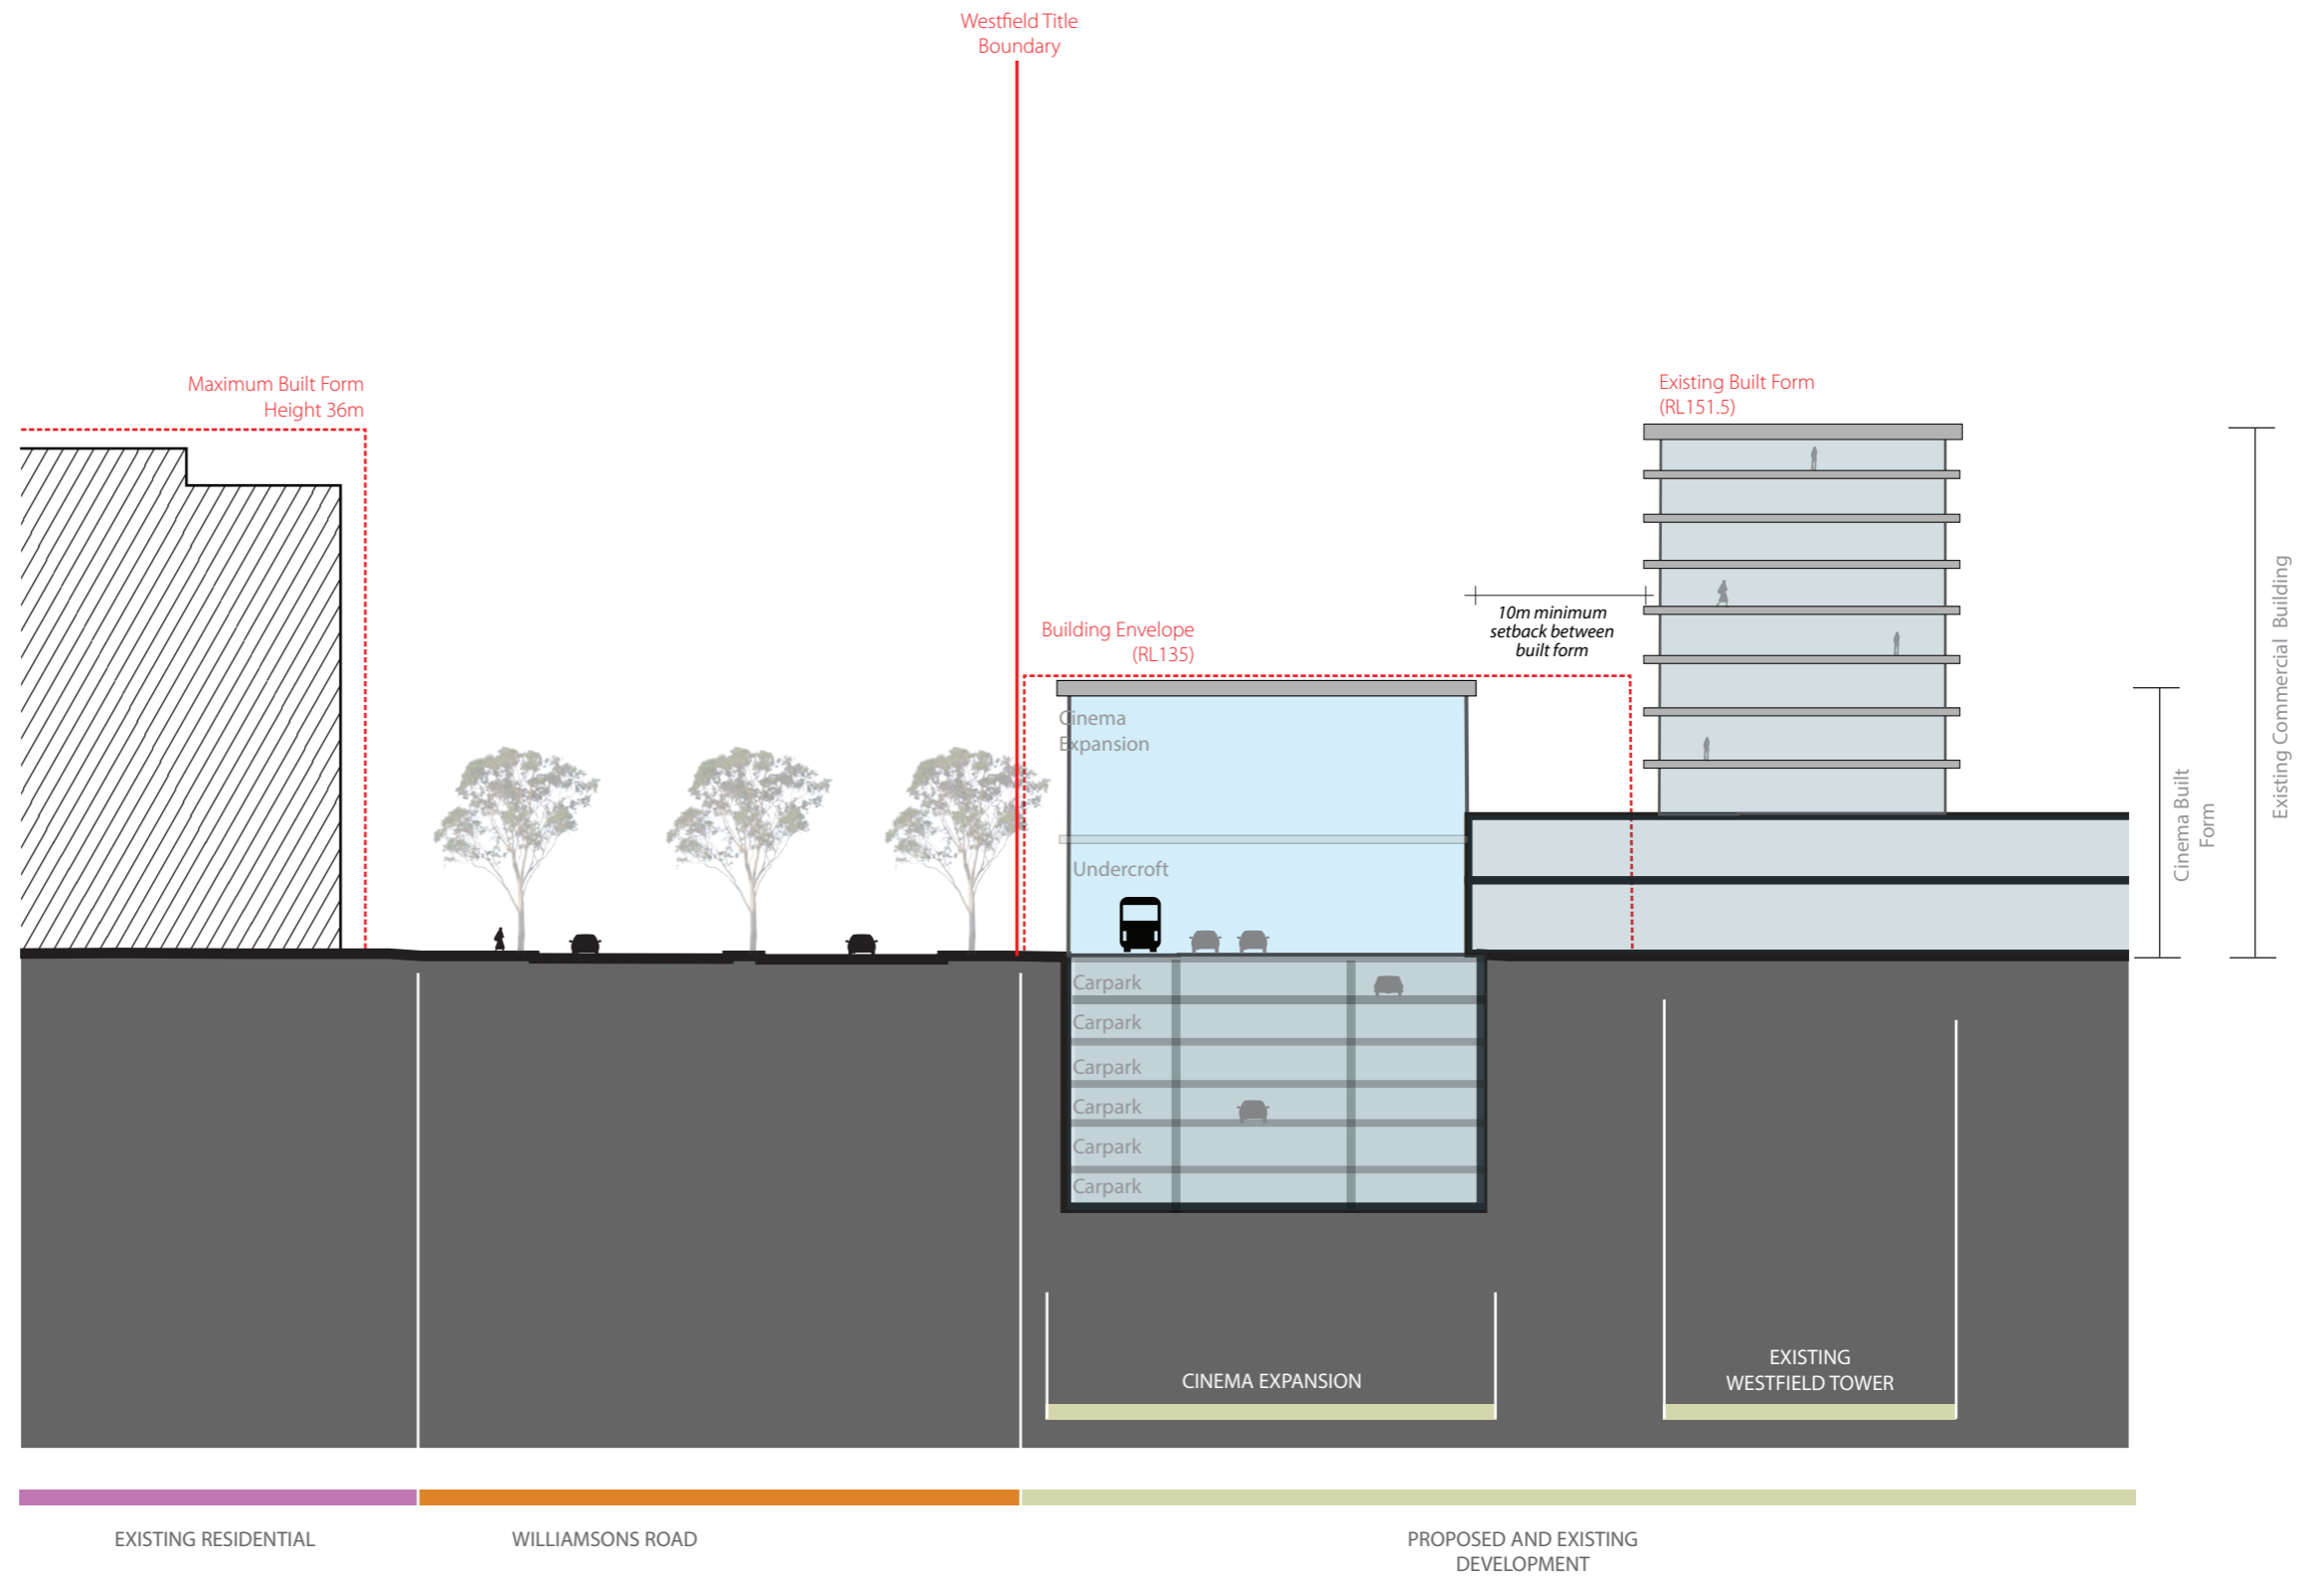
Proposed typical section through bus interchange and Williamsons Road showing potential upper level uses ( Floor levels are indicative only)
